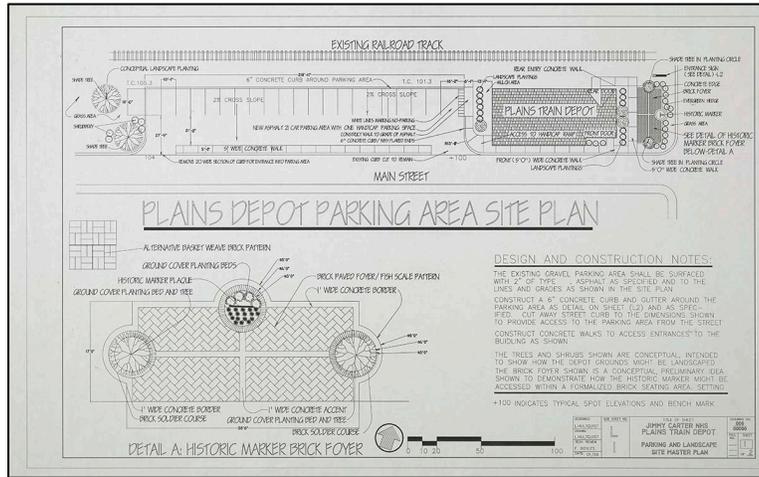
Proposed landscape plan for the depot dated 1999. This plan was never installed, and instead a simpler design—mostly through the addition of a walkway—was installed. (JICA Archives 44\_JICA-269\_9239\_979\_ParkingAreaPlan1990s).
